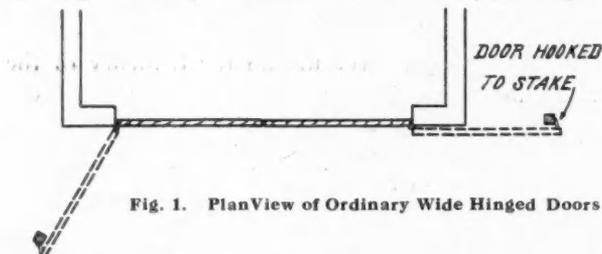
Plan View of Ordinary Wide Hinged Doors
